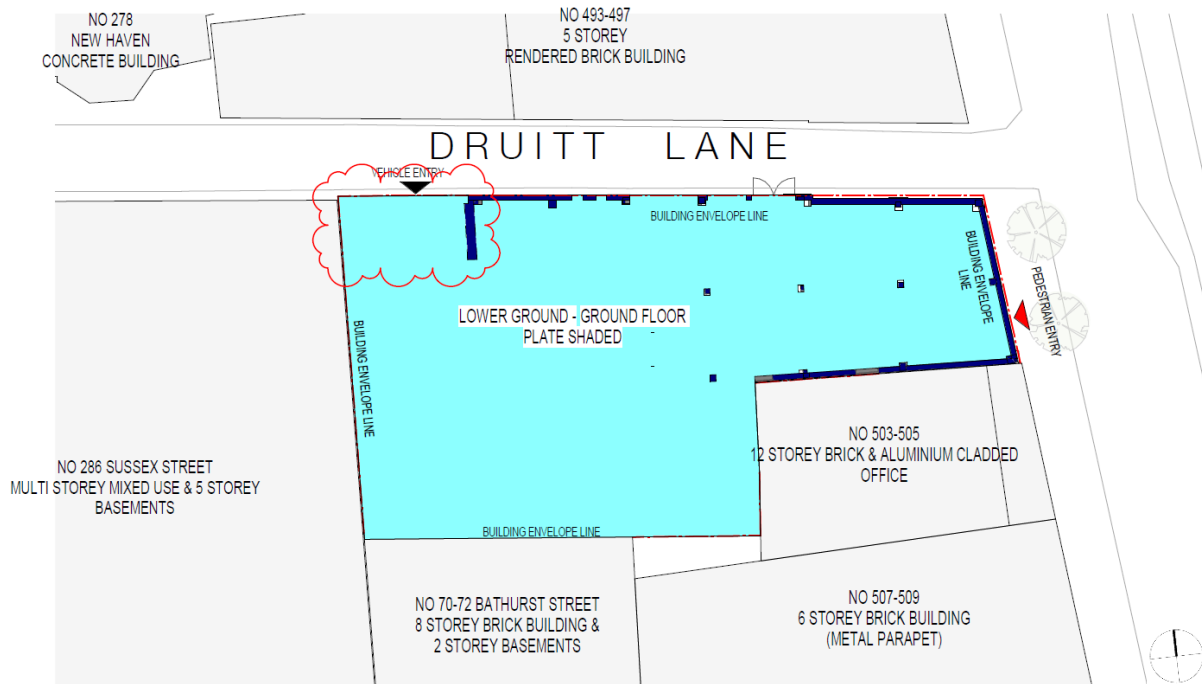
Proposed concept envelope plan - lower ground and ground levels
